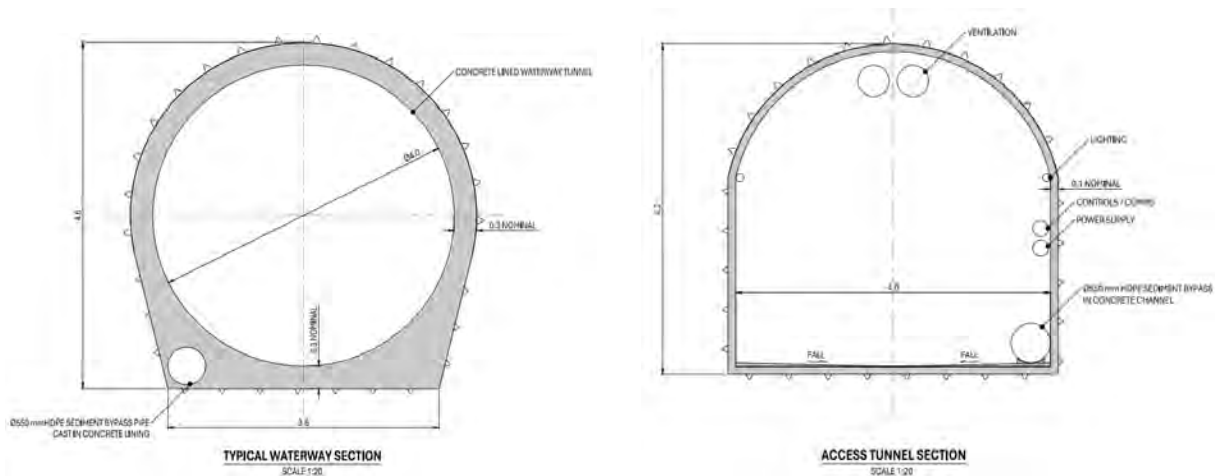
Cross sections of the Pressure Tunnel (left) and Access Tunnel (right).
